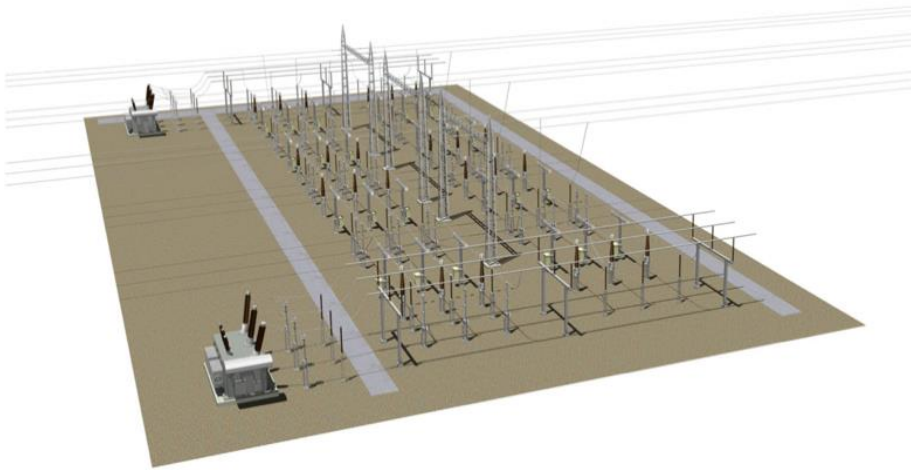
3D image of DCB solution (with DCB Ringbus)
